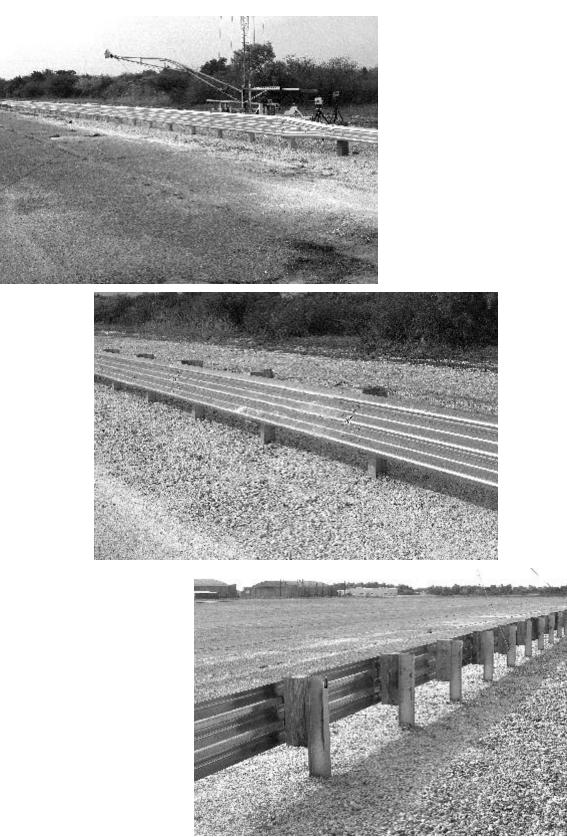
Thrie beam guardrail installation prior to test 404211-10.
